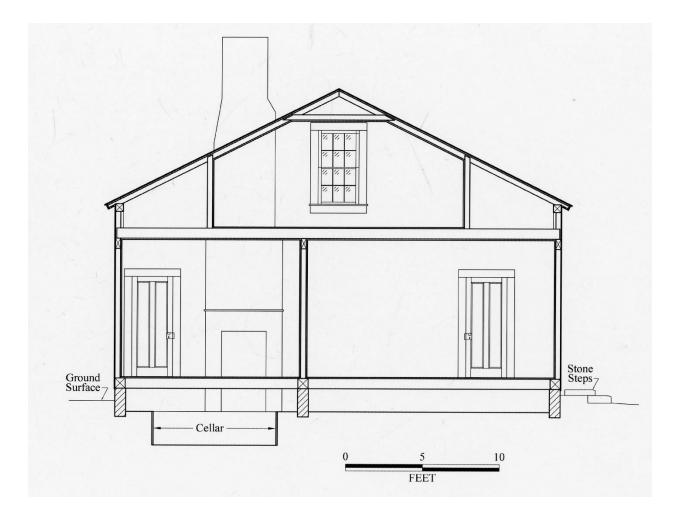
Conjectural sectional view of House A, looking north through the southern half of the house, circa 1860. Given its 1840s-era construction, the house is believed to have been timber framed. Framing details are speculative, though are representative of contemporary housing in Springfield and Illinois. Note the shallow character of the cellar beneath the southwest corner of the house. Although the approximate depth of the cellar was established during the archaeological investigations, its dimensions remain unknown at present.
